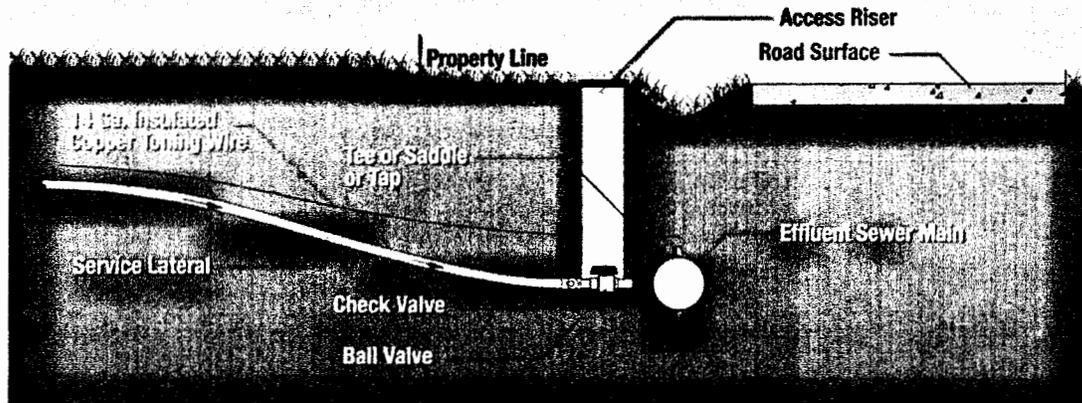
Typical Service Connection to Effluent Sewer Main
